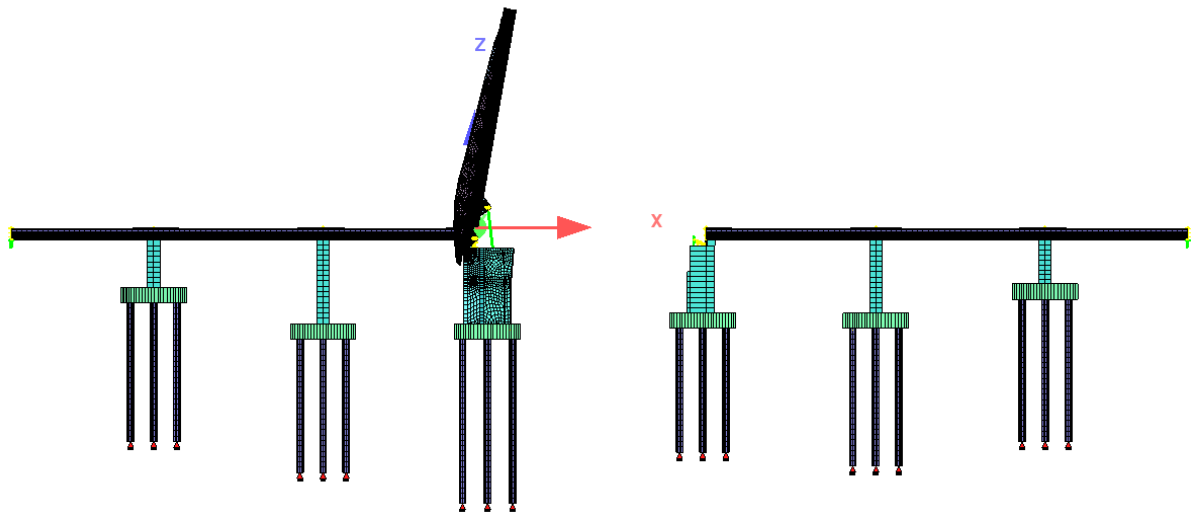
SBR Global Model – Elevation view with Lift Span deck in open position (closed for vehicle traffic)
